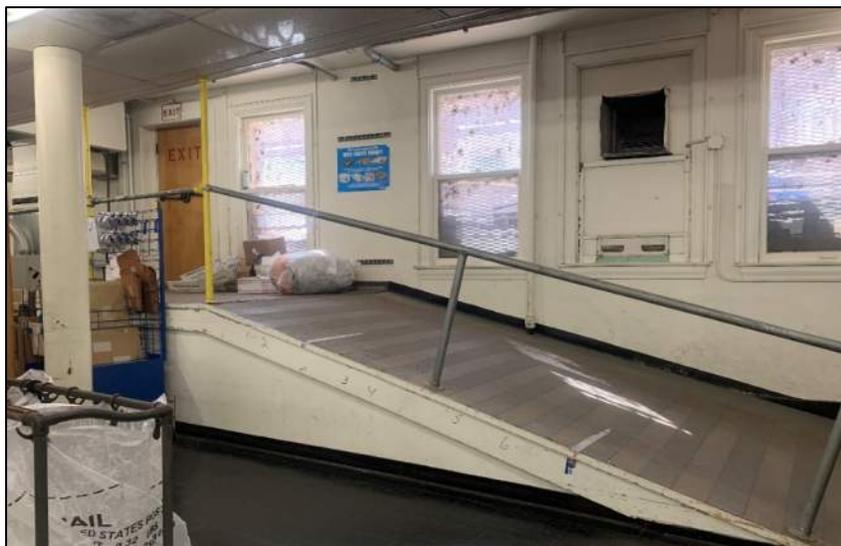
Post office sorting room ramp against south wall, looking south. March 2021.
